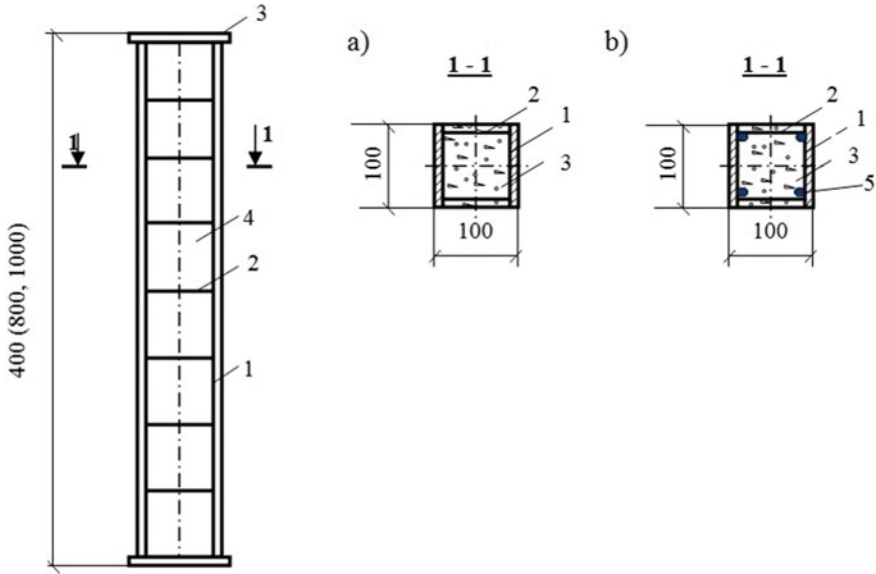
Scheme of test samples a–without longitudinal reinforcement; b–with longitudinal reinforcement; 1–longitudinal sheet reinforcement; 2–transverse reinforcement; 3–end metal plates; 4–aggregate (concrete); 5–additional longitudinal reinforcement
